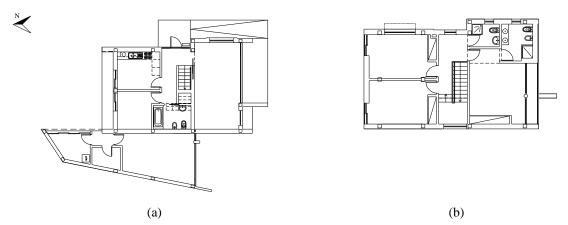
Architectural blueprints (no scale): (a) ground floor level; (b) elevated floor level
